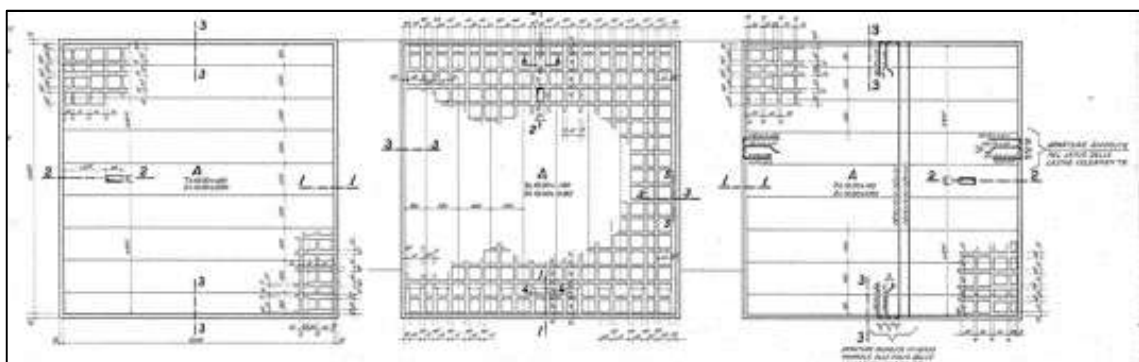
Lot Qa19-Solution for slab floors implementation with the use of Celerpan type of lattice plates. (D/7509_F165.2 T9).
